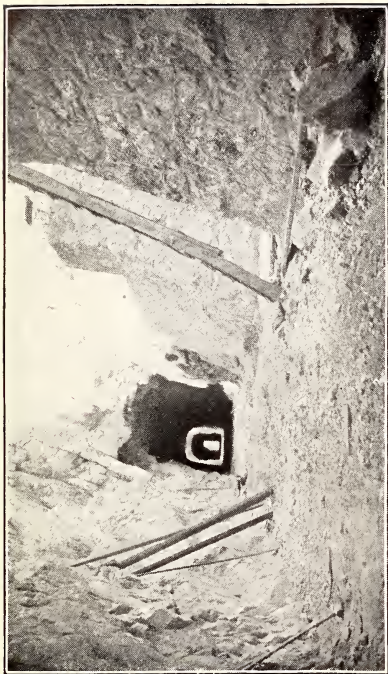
TUNNELS AND RETAINING WALLS ON BEAR RIVER CANAL.
